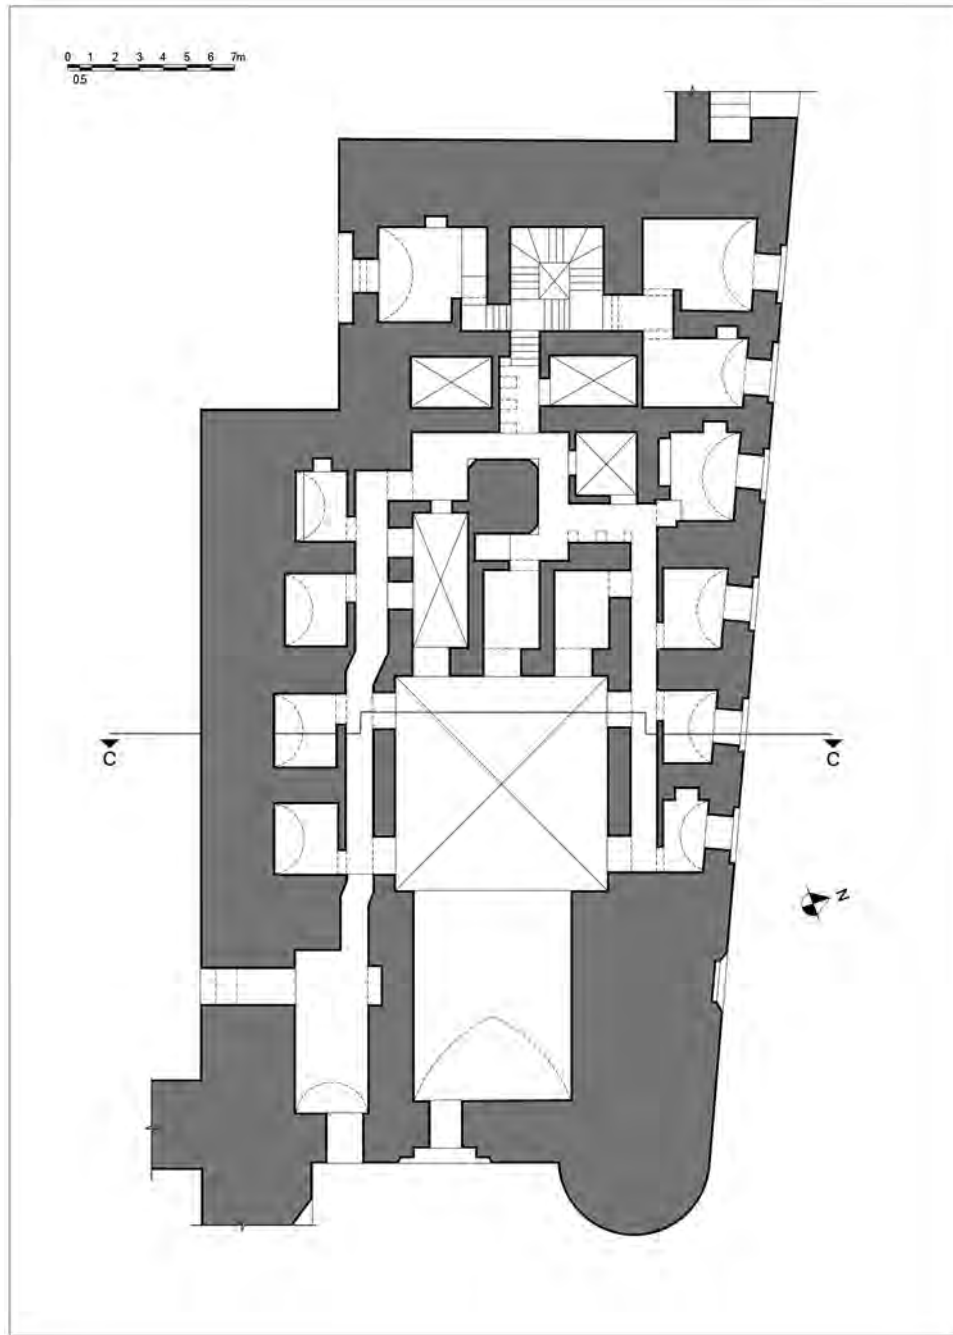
Shāfi'iyah Madrasah, Complex of Sultan Ḥasan, Cairo, second floor plan (H. Al-Harithy)
